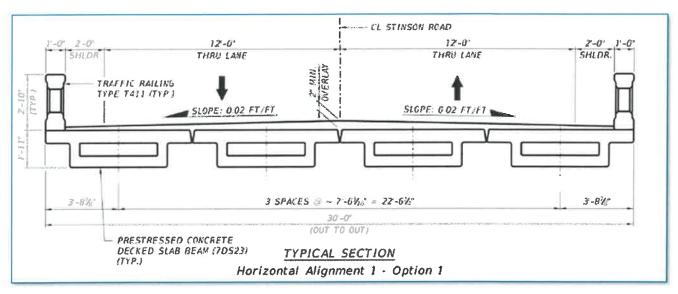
TxDOT Prestressed Concrete Decked Slab Beams (7SB23) Typical Section
